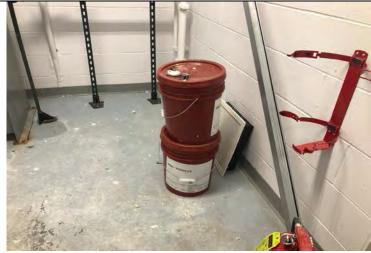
Two 5-gallon buckets of Humble Hydraulics H 32 hydraulic oil in the new vocational agricultural elevator machine room.
